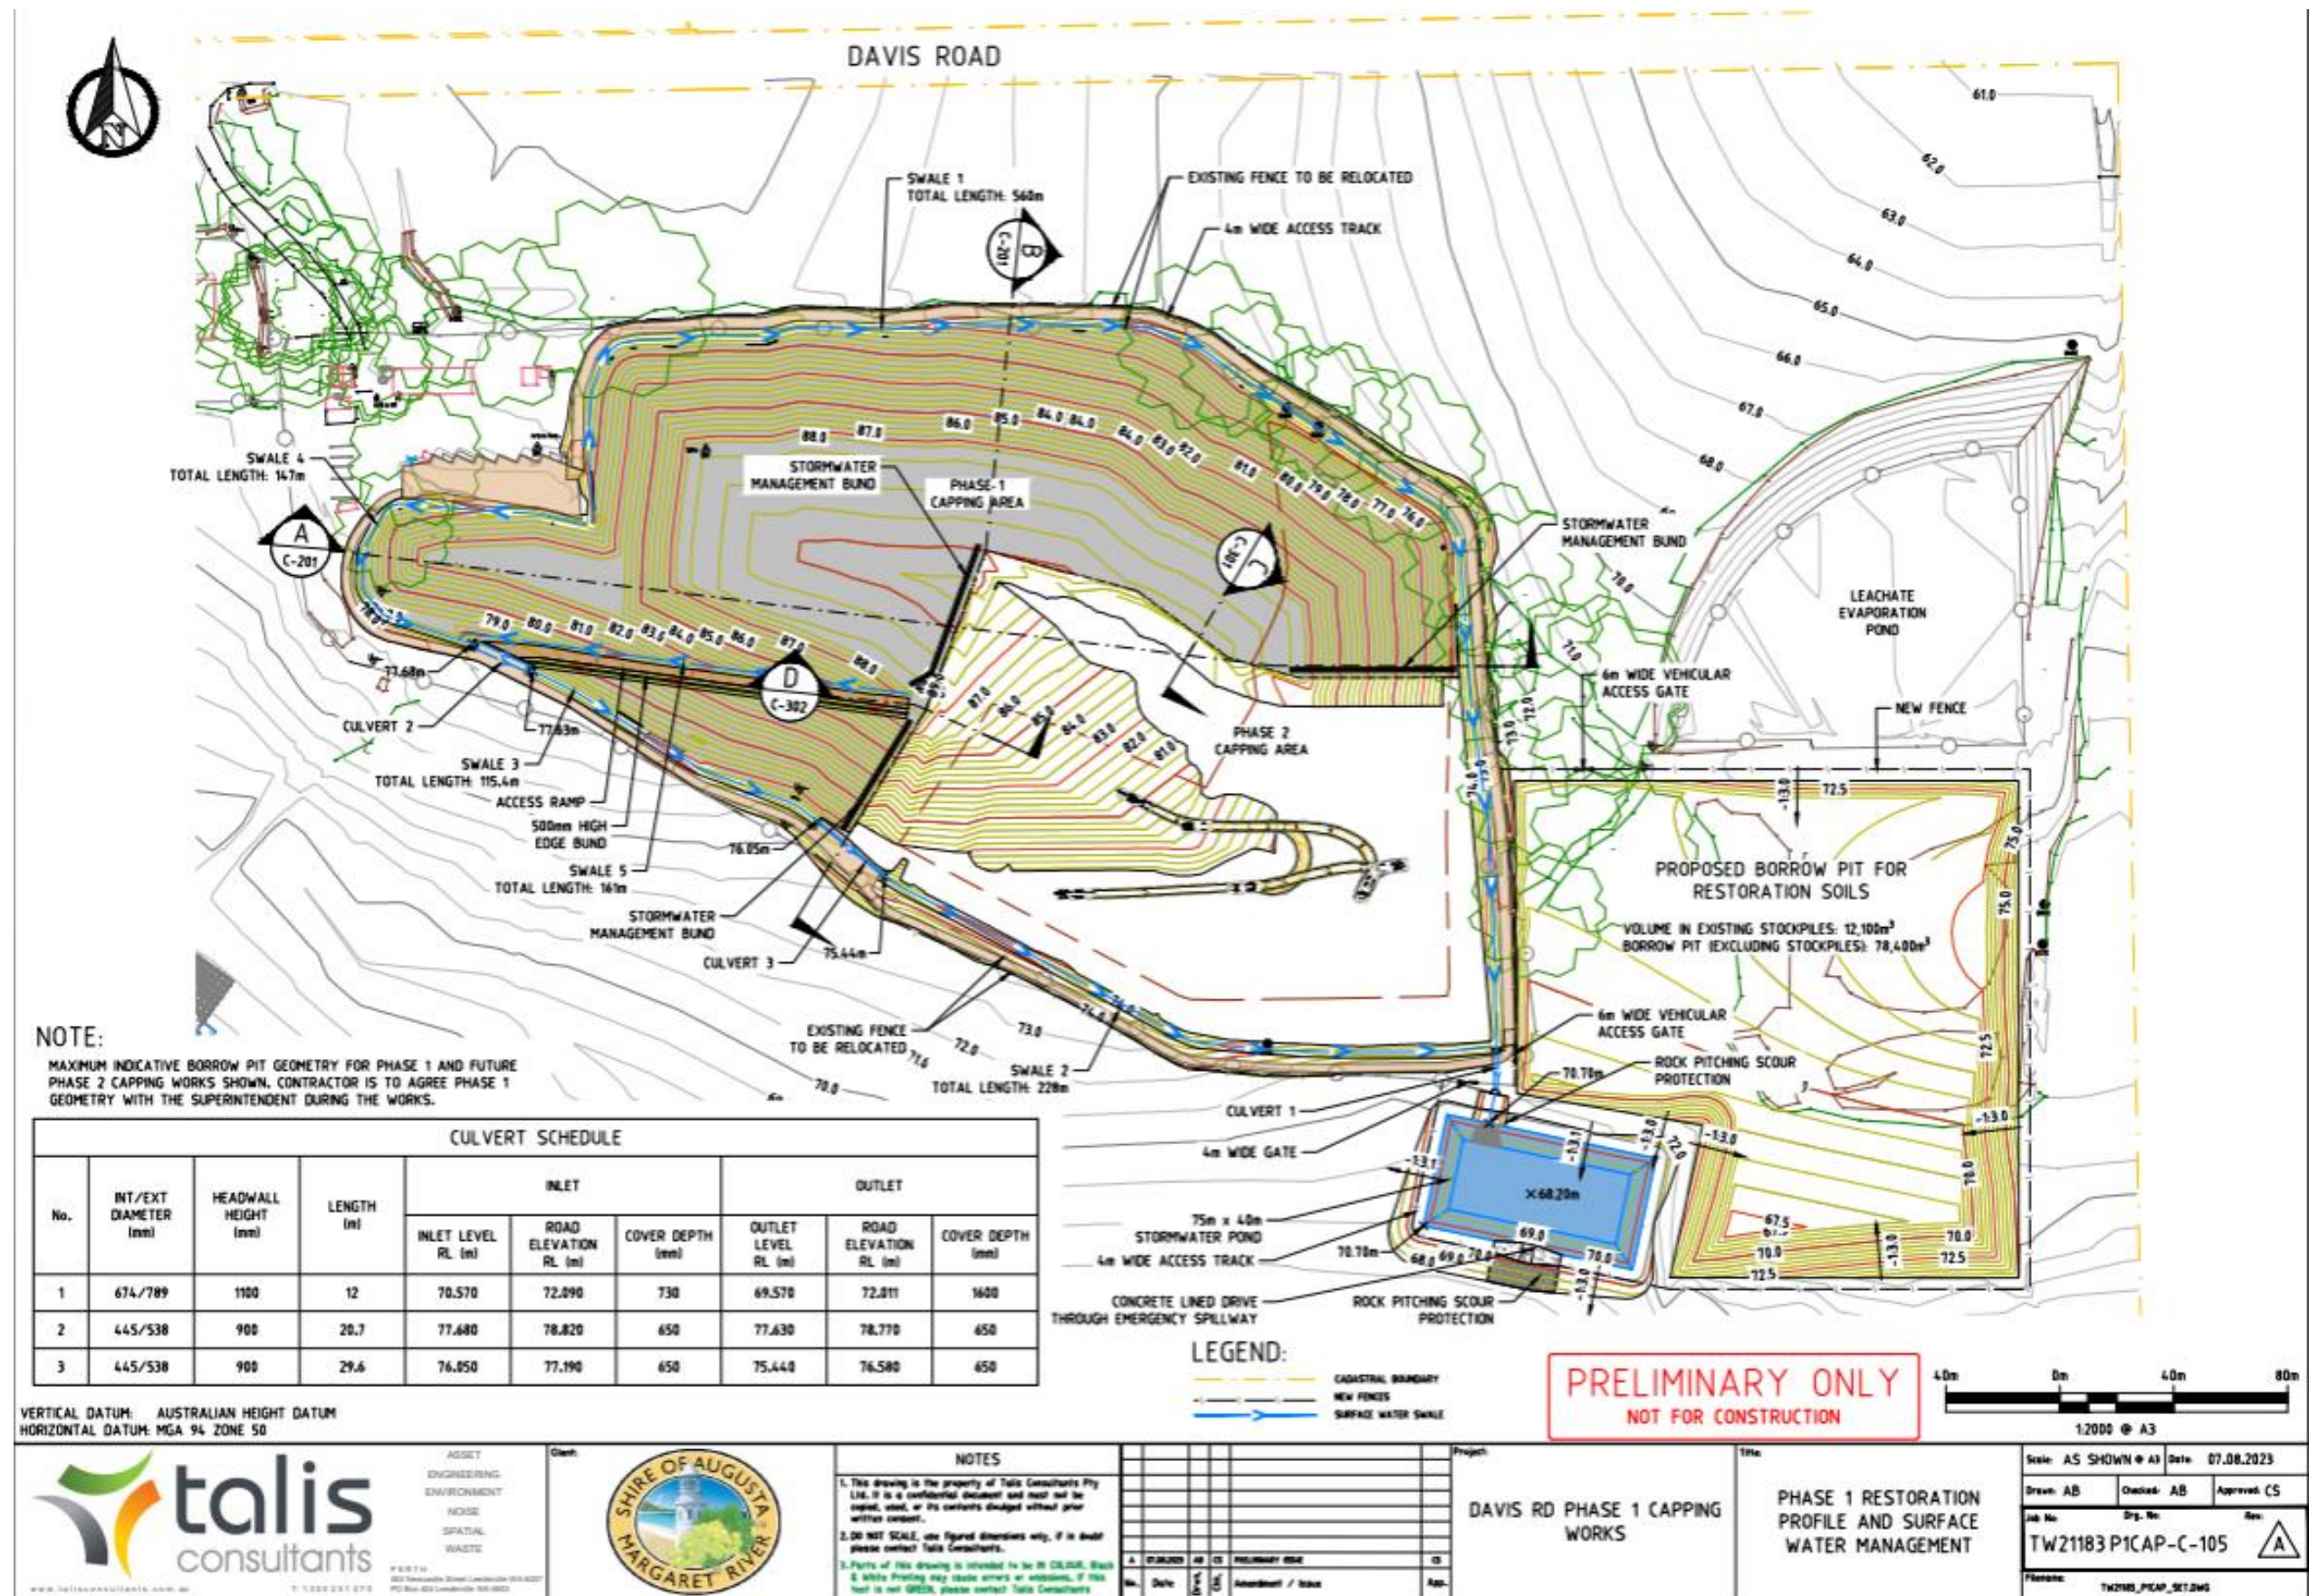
Pond 1, stormwater swales and culverts for Phase 1
